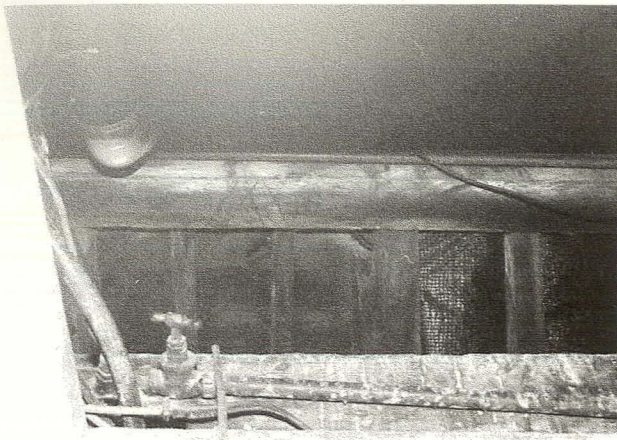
Roof Timbers with Joiner's Marks, North Wing
